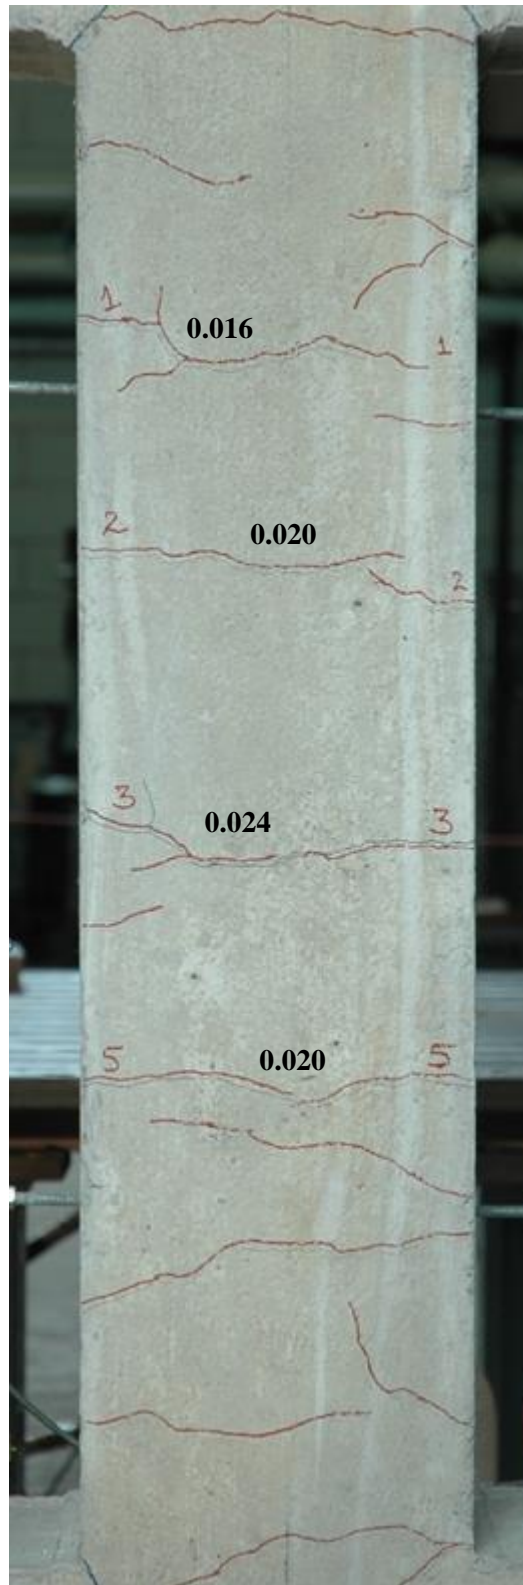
Cracks on west face of TS01 at Load Step 19
